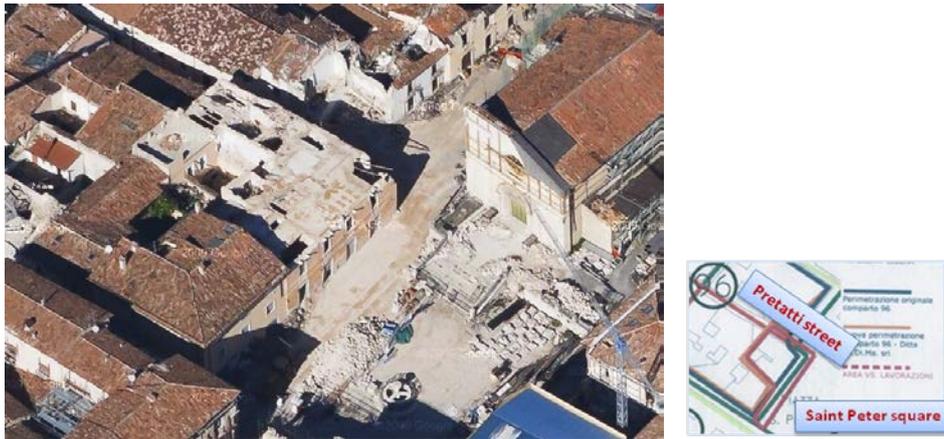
The building site after the controller demolish work. Edifice area perimeter, the plan.
